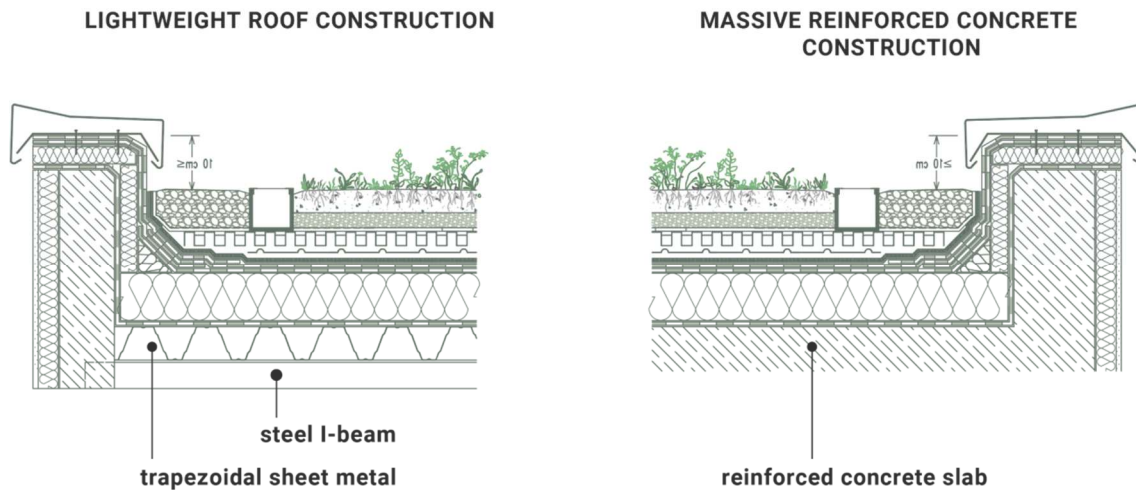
Types of roof structures suitable for reconstruction [author's archive].
